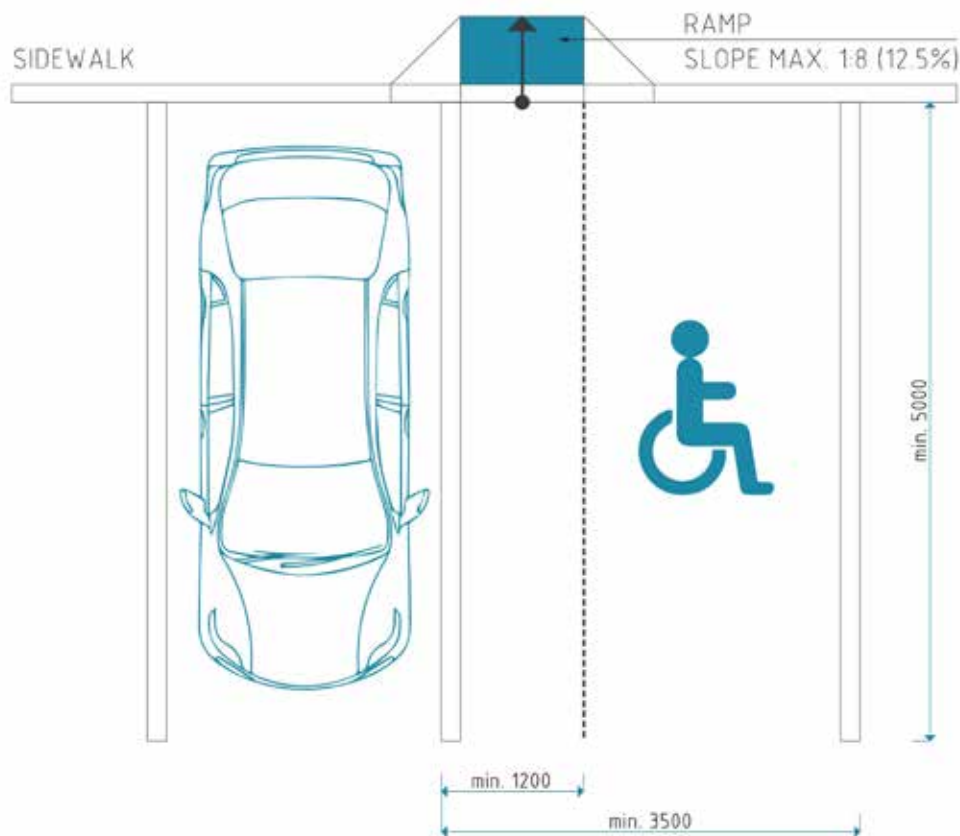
Parking space dimensions in transverse parking layout (Čerešňová, Suláková)
